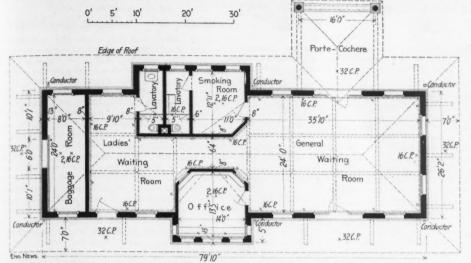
FLOOR PLAN OF PITTSBURG & LAKE ERIE R. R. PASSENGER STATION AT BEAVER, PA.
